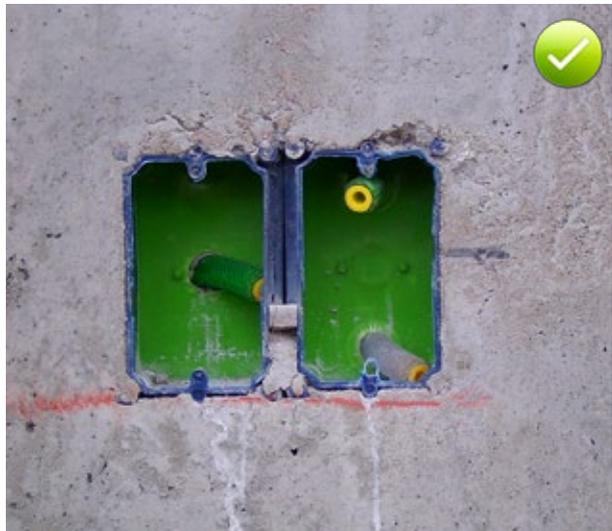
Protective hose end / junction box opened after stripping the wall formwork
